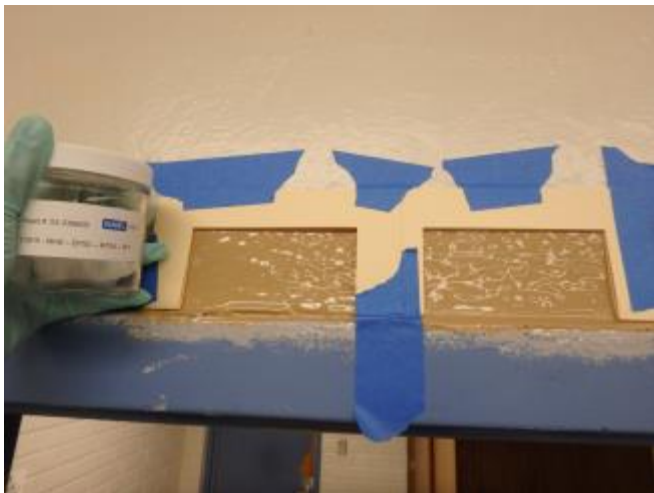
Room 704 – Surface wipe sample (010816-MHS-B700-R704-W1).
